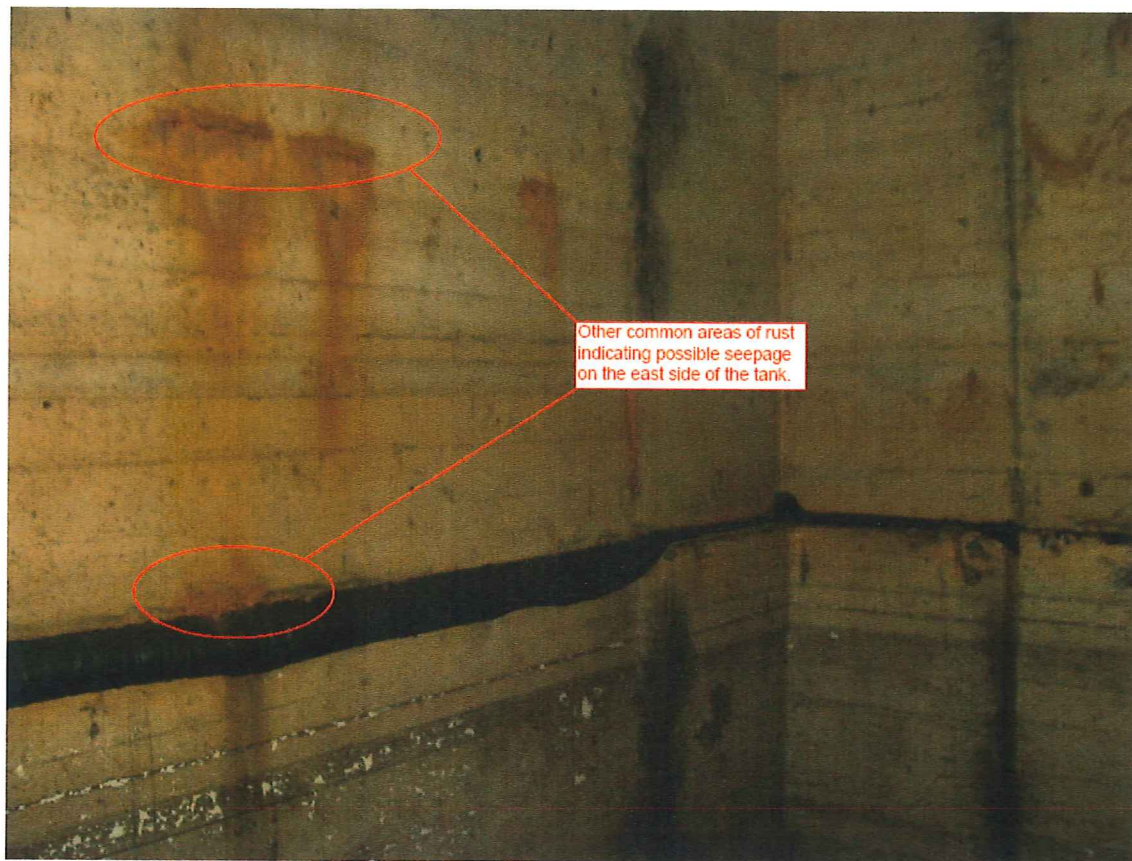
Areas of Rust on East Side of Inspection Building Holding Tank
